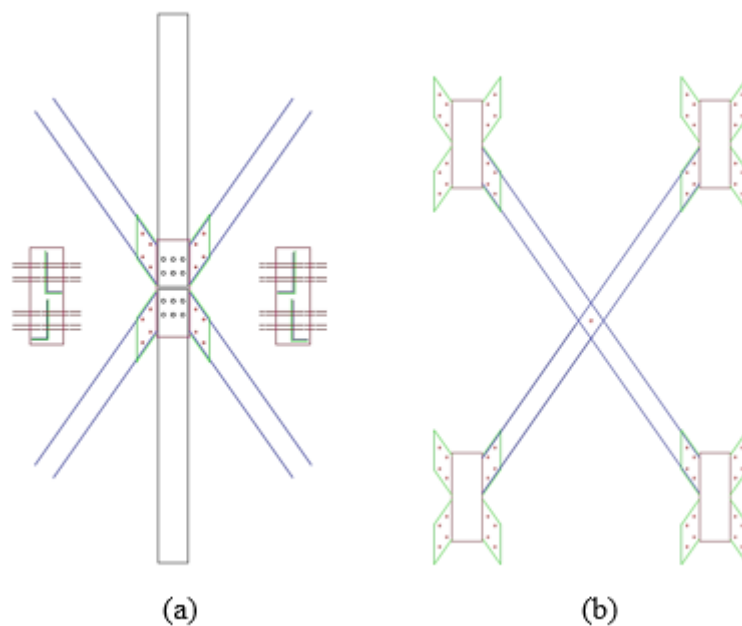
(a) Bracing-to-column connection and (b) Bracing-to-bracing connection
